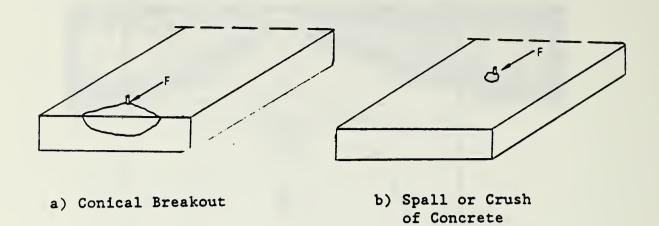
Types of Concrete Failures of Anchors in Shear
